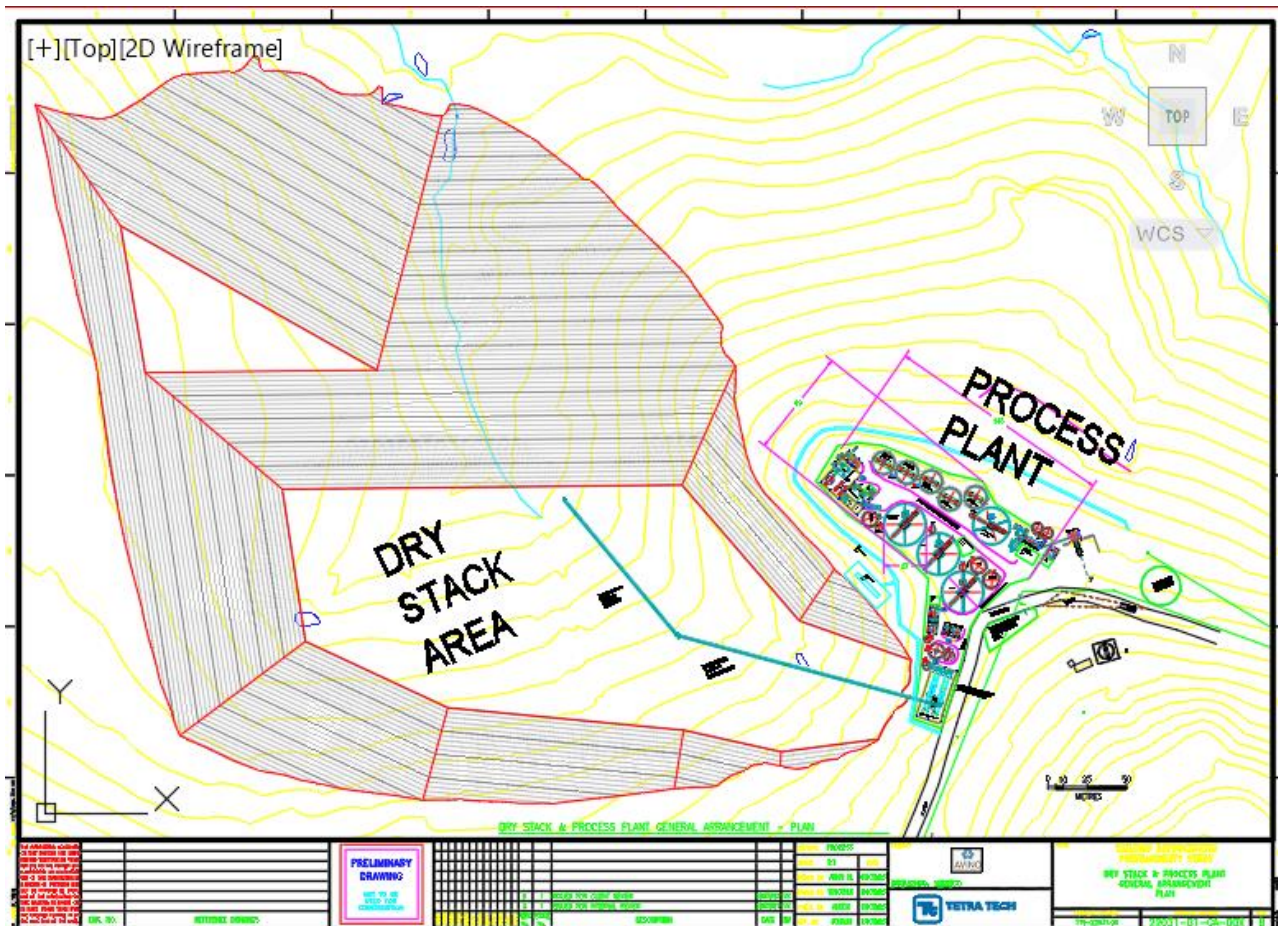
General Arrangement of Processing Plant Area and DSTMF (Tetra Tech, 2023)
